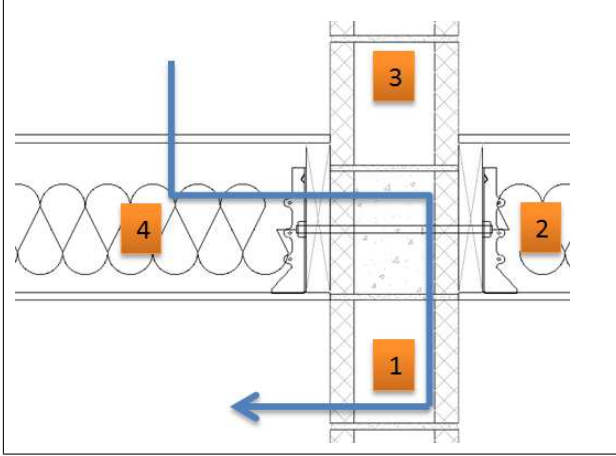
Cross-section of the reference specimen comprised of concrete masonry wall connected to a wood joist floor by a cross-junction. The numbering of the elements is shown. The blue arrow shows the flanking transmission path of interest (R_{41}).
